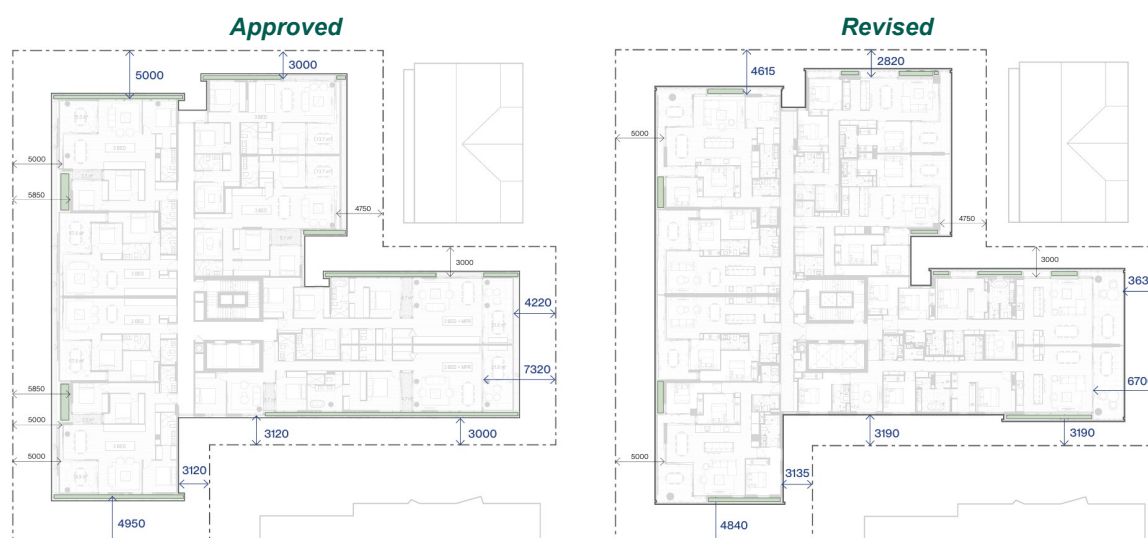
Typical Floor Plate Comparison (levels 3-11)
